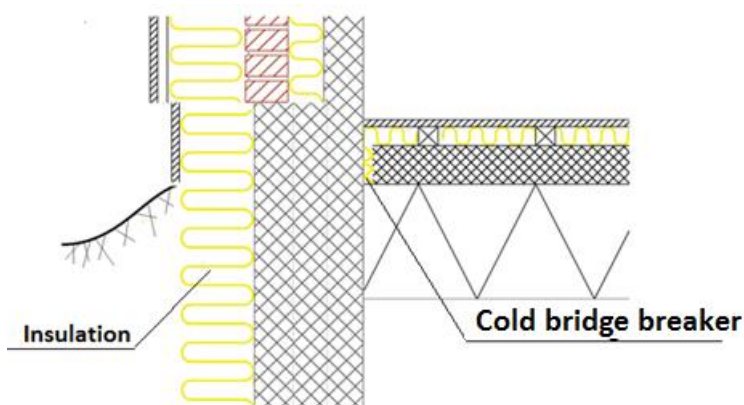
Insulated foundation and footing from the outside, cold bridge breaker at floor deck.
